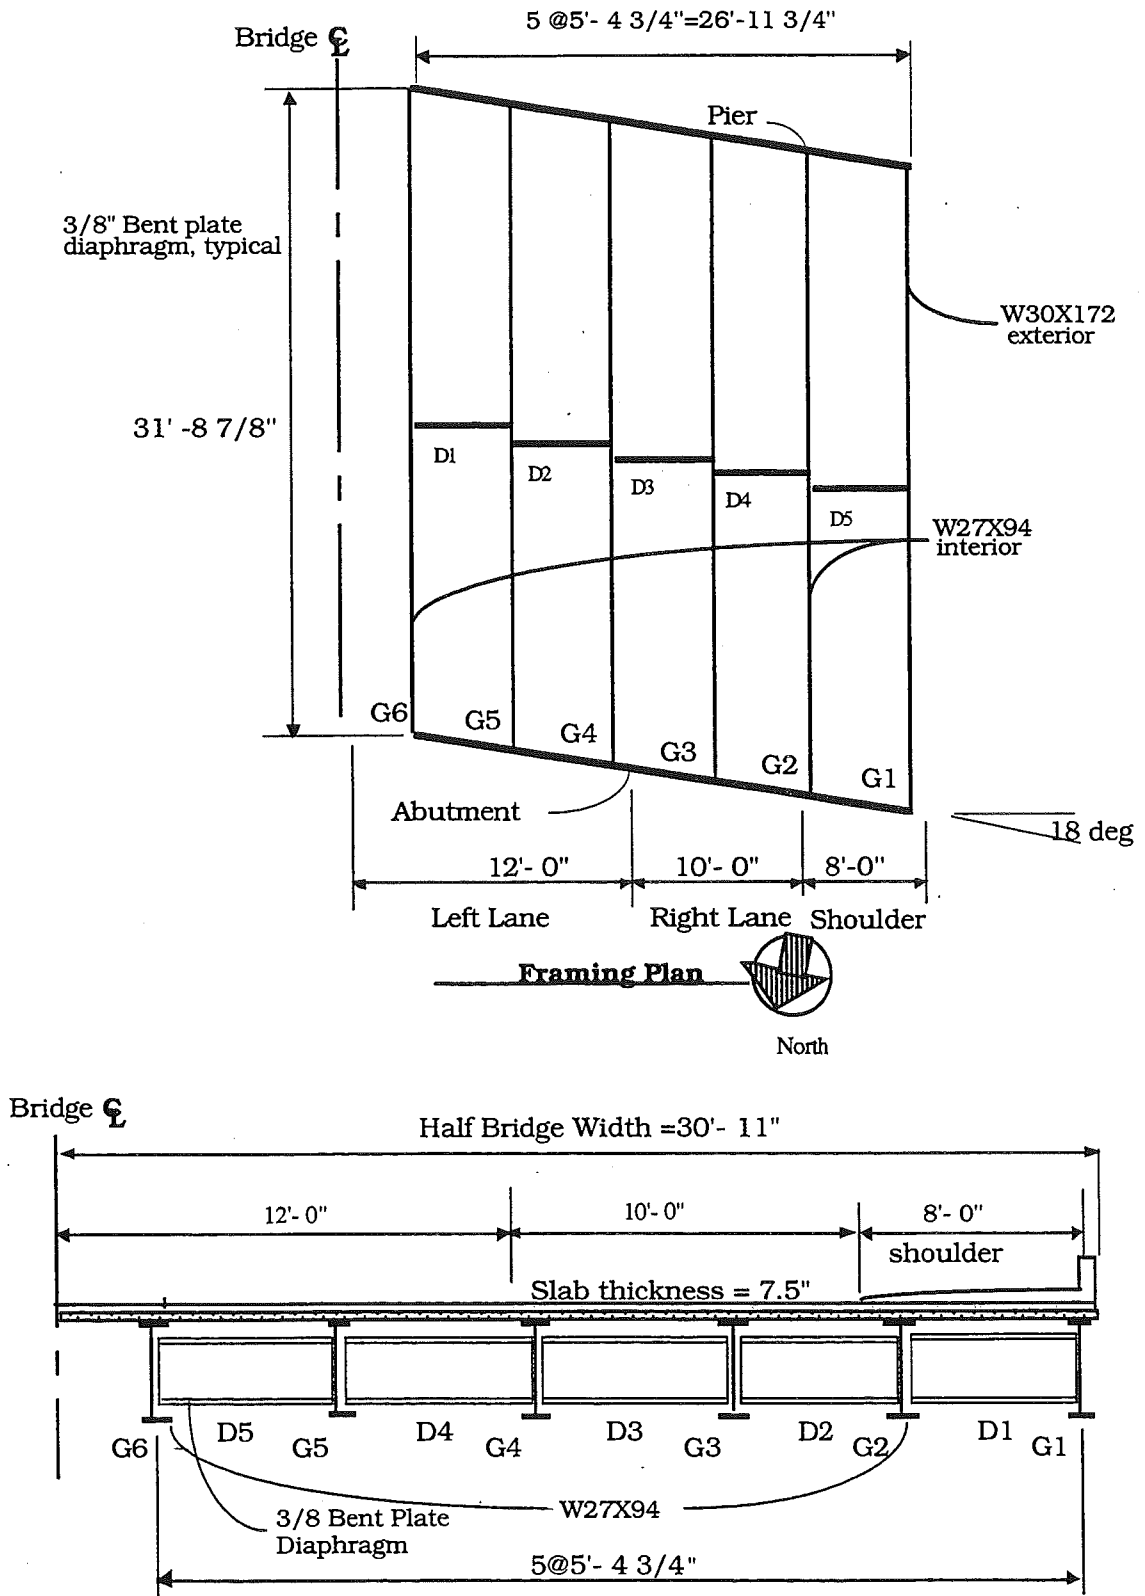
Bridge LA/I94, Lonyo Avenue Southbound over I94 Westbound in Detroit. Plan View and Cross Section of Entrance Span.
